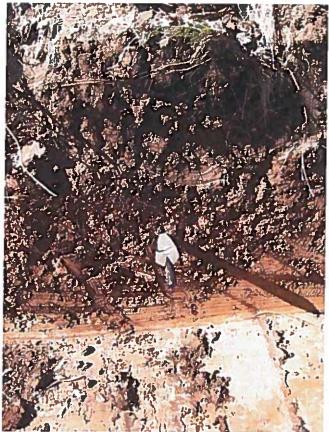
Facing northwest toward side wall in GAT #3 illustrating stratigraphy.
